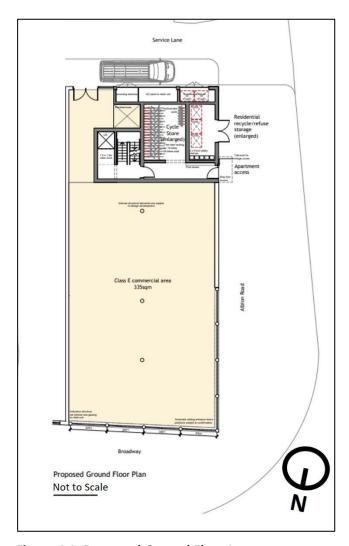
Proposed Ground Floor Layout (extract mab Architecture drawing A-100C)
